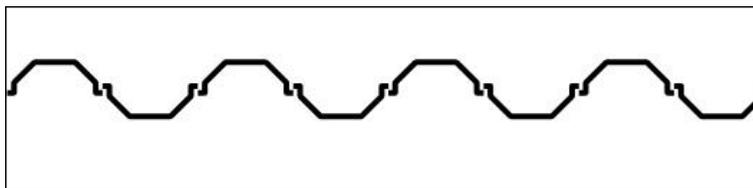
Schematic of a “Standard U” type sheet pile wall
